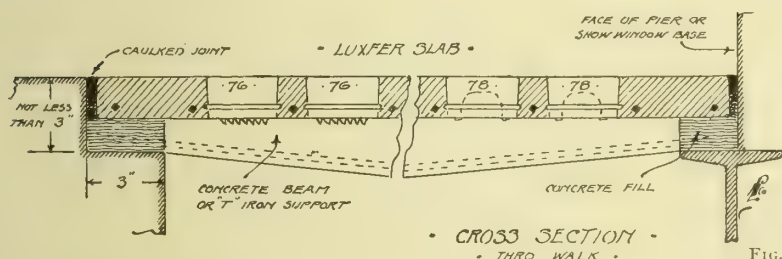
LUXFER REINFORCED CONCRETE SIDEWALK LIGHT
